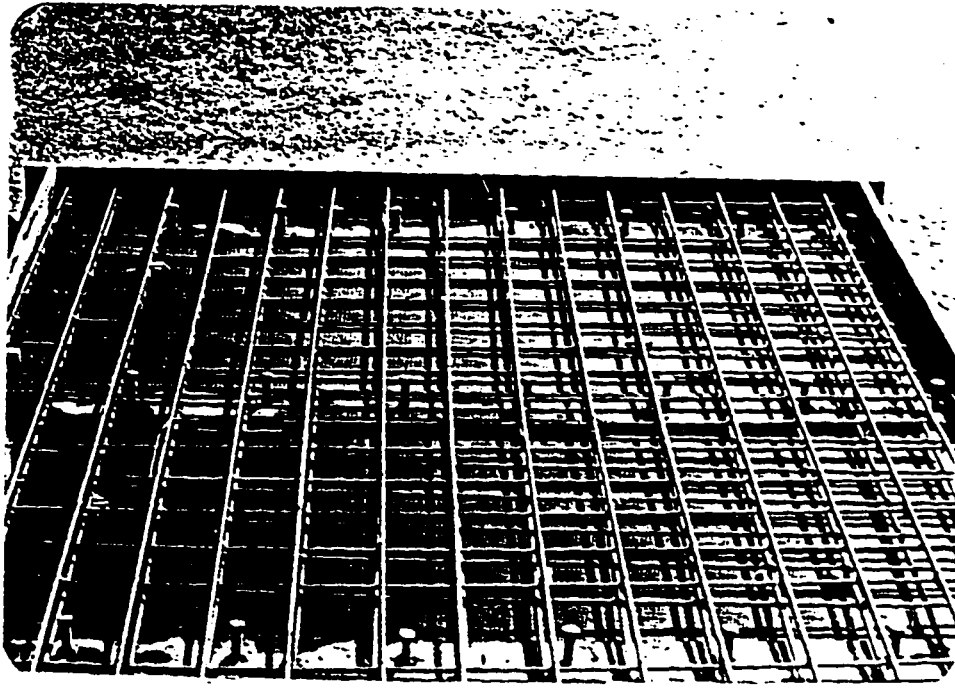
View of Reinforcement Layout in Typical A3-Series Panel.
